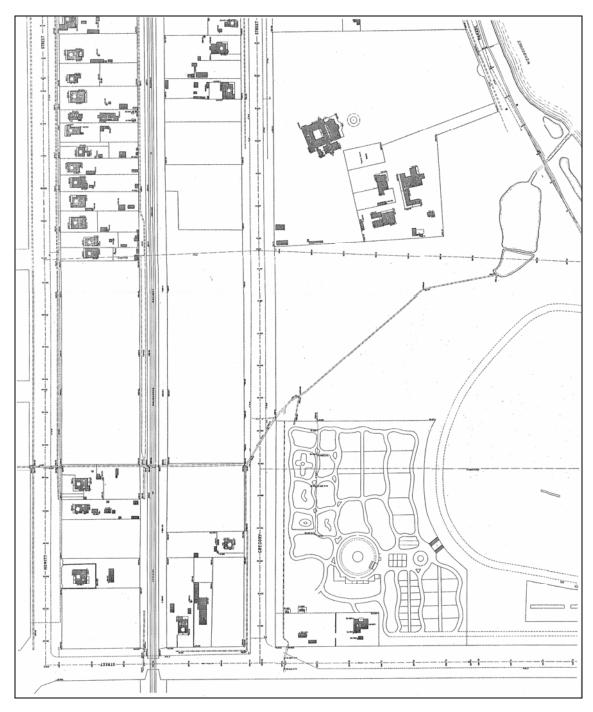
Ballarat Sewerage Authority Plan, 29 October 1934. Source: Wendy Jacobs.
